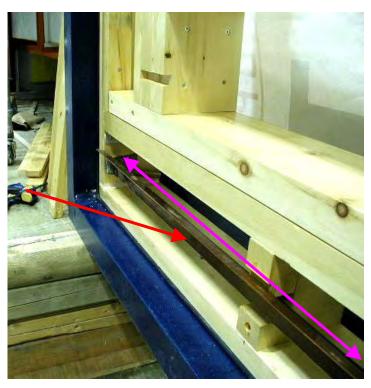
Installation of a metal trough to collect accidental water on the exterior face of the water resistive barrier, across the half-Specimen. Same trough system was installed independently on the other half of the Specimen.
